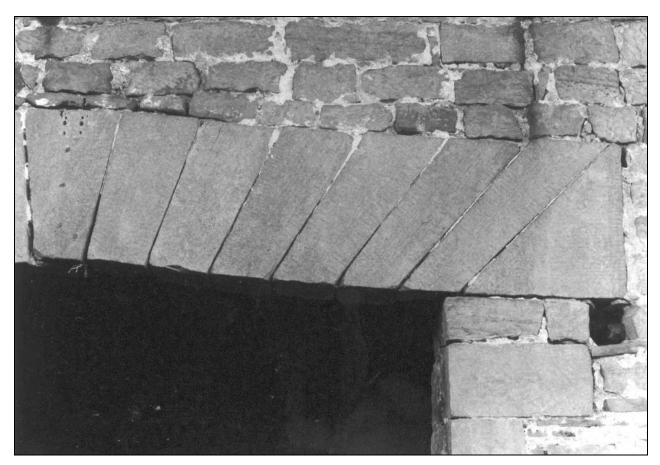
Detail of voussoirs, west cart entrance to barn (film 5, frame 3)
